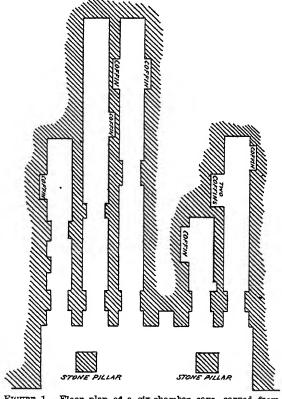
Floor plan of a six-chamber cave, carved from the stone cliffs near Kiating. Native rock pillars have been left in the common entrance. Length, 130 feet; breadth, 54 feet
